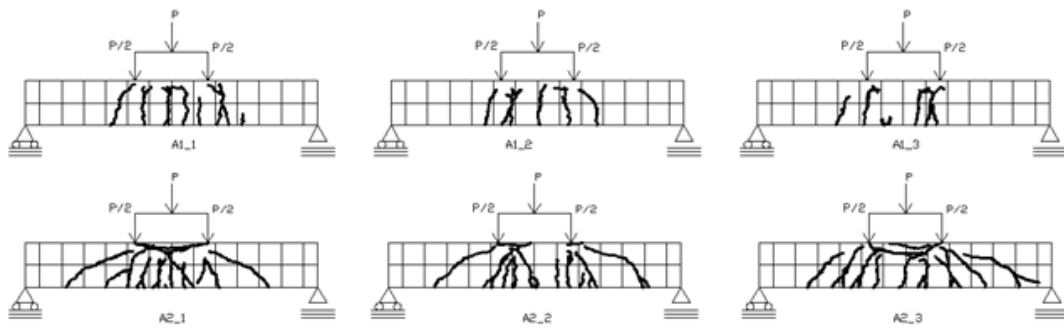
Crack patterns in RC structural elements after bending failure.
